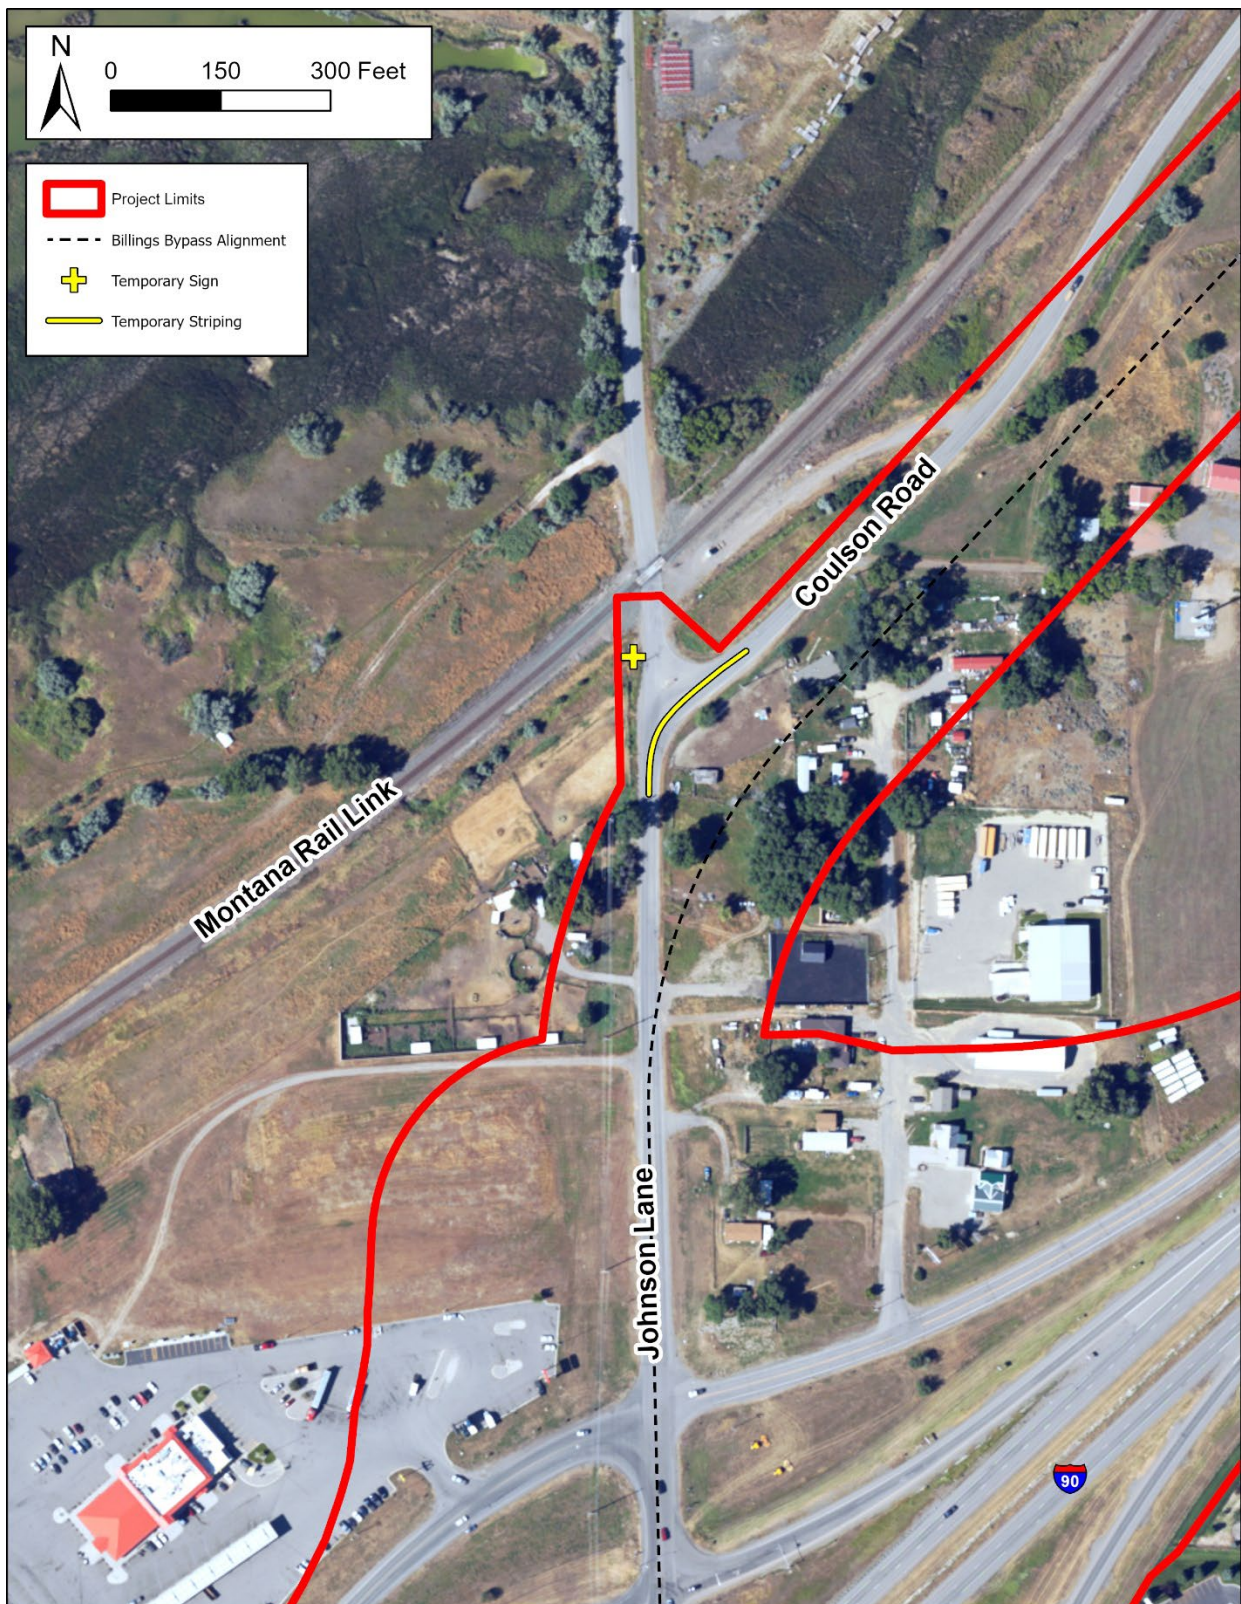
Signage Locations & Traffic Control at Johnson Lane and Coulson Road Intersection
